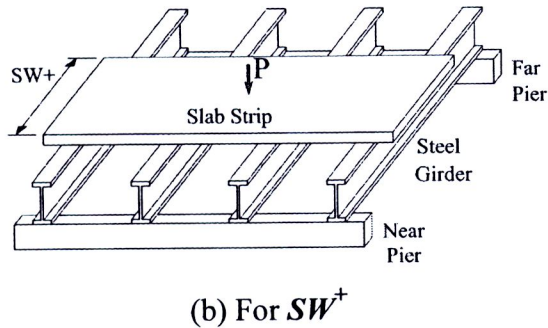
(Cont't) Effective Strip Width (SW) of concrete deck supported on parallel girders
